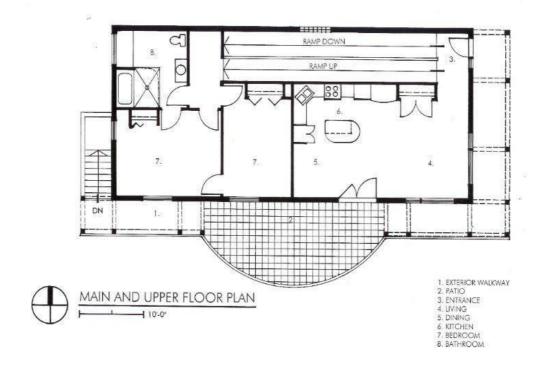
Floor Plan of the Premier's Council Office Summary
